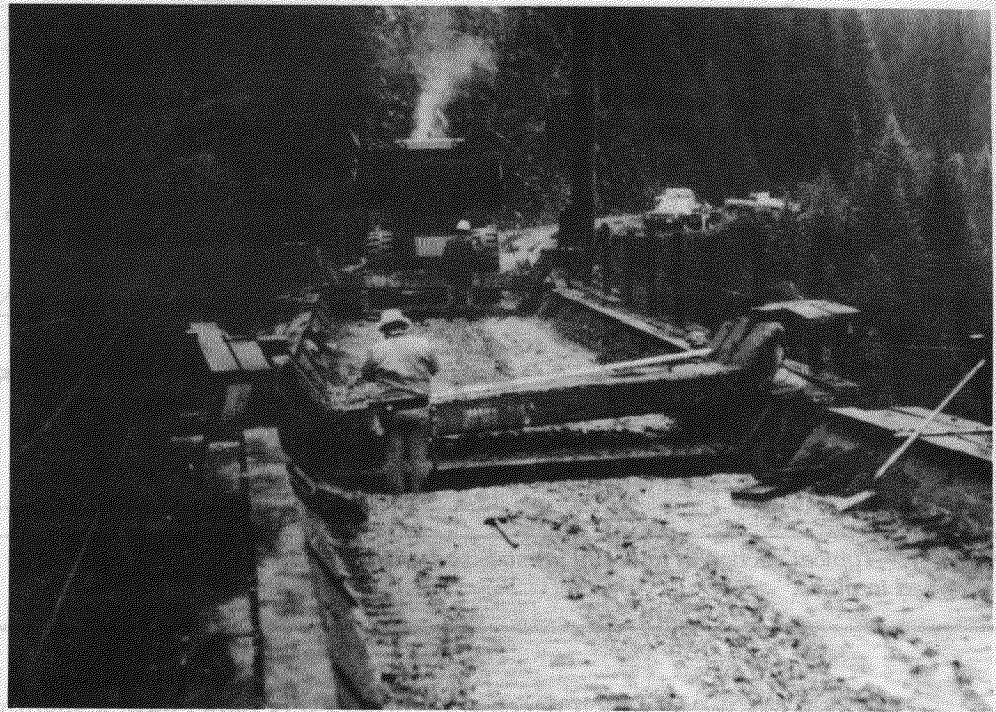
Concrete ballast boxes were lifted during surveying operations to allow survey and design of new concrete deck panels to fit the existing steel bridge girders.
